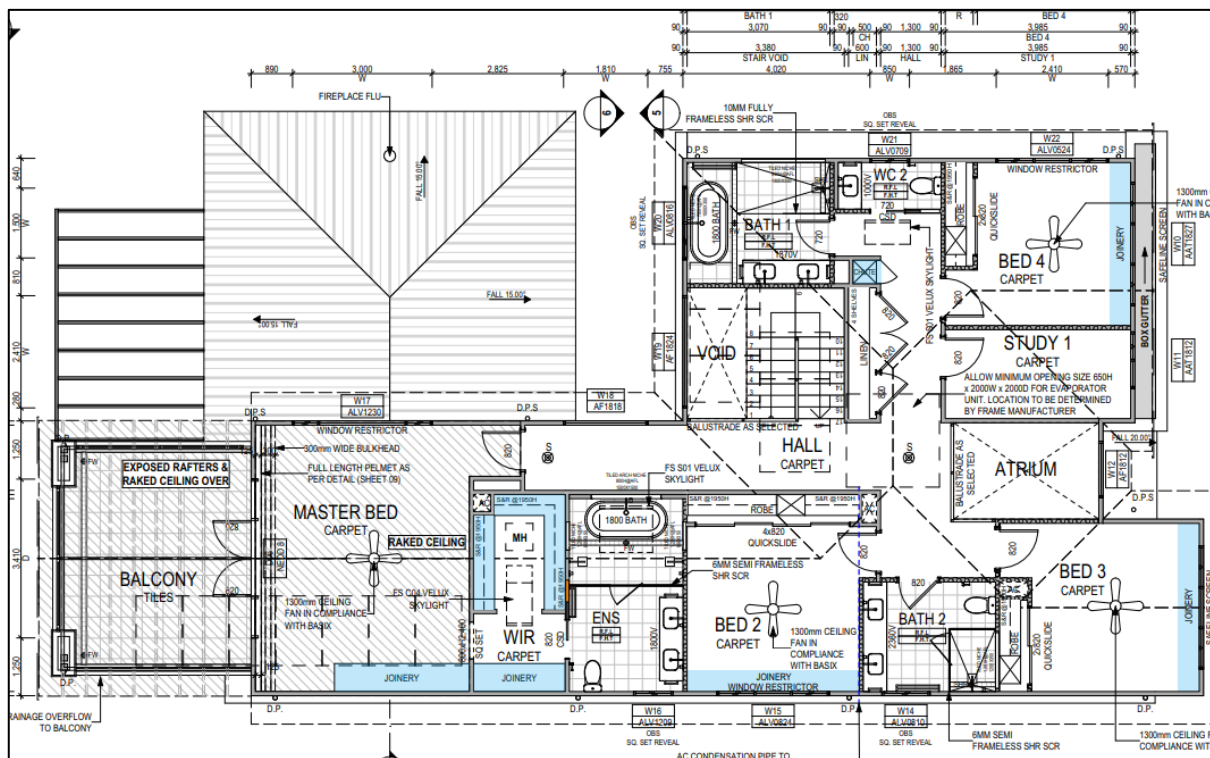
Proposed First Floor Plan (*source: Hall and Hart, Rev G*)
